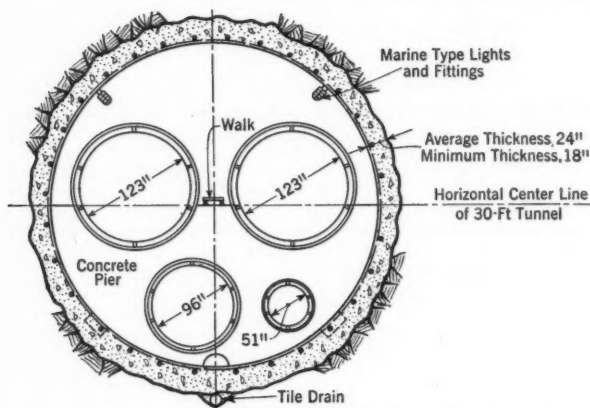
SECTION OF 30-FT TUNNEL (A-A, FIG. 25) SHOWING ARRANGEMENT OF OUTLET PIPES AND SUPPORTS
